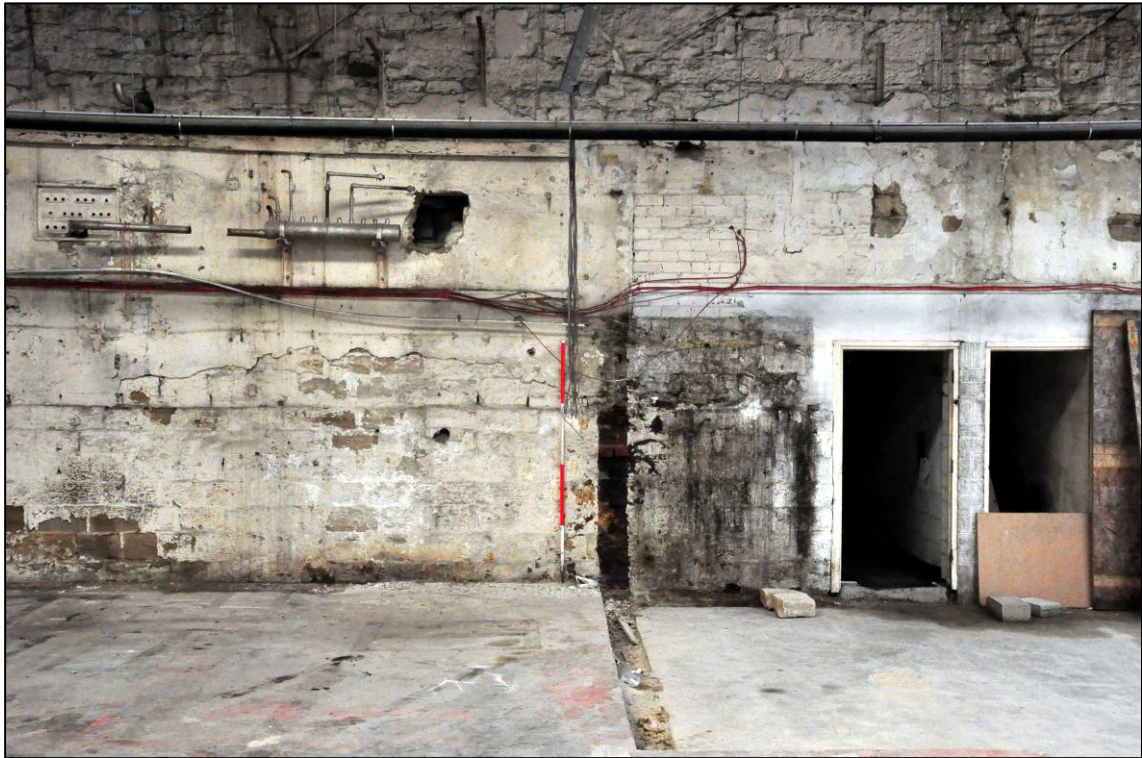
Weaving shed (Unit C), south end of west wall, showing bearing box from northern engine house, looking W (photo 11691).
